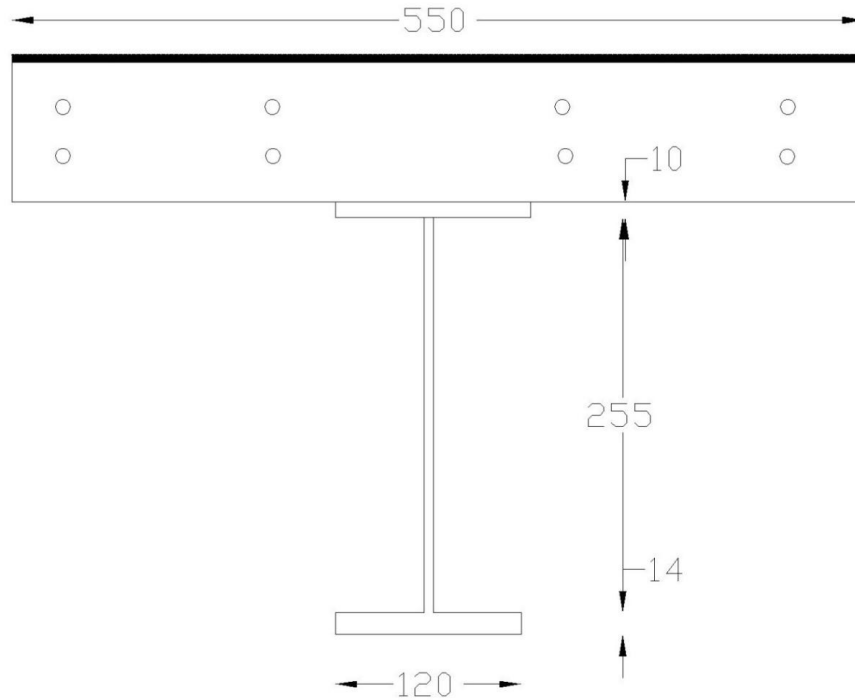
Section 2-2, Steel-Concret section with CFRP
